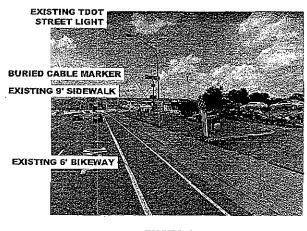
NORTH ALONG ROSA L PARKS BLVD
